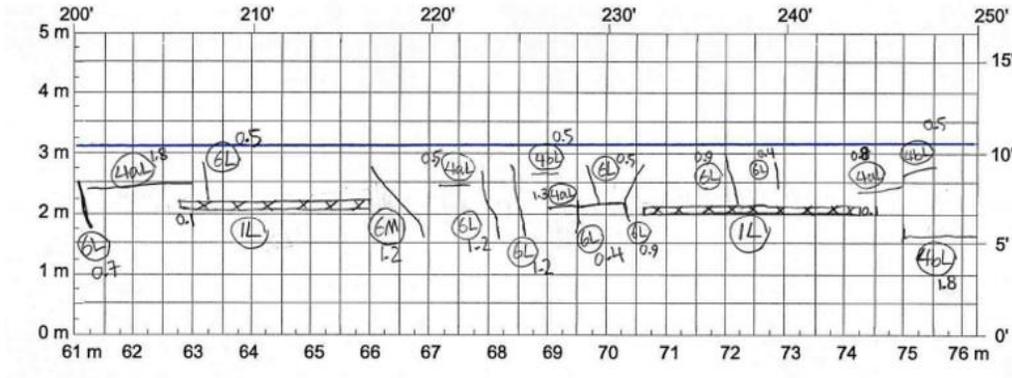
Map. Fatigue cracking propagation on test section 05_0803 in 2014.
